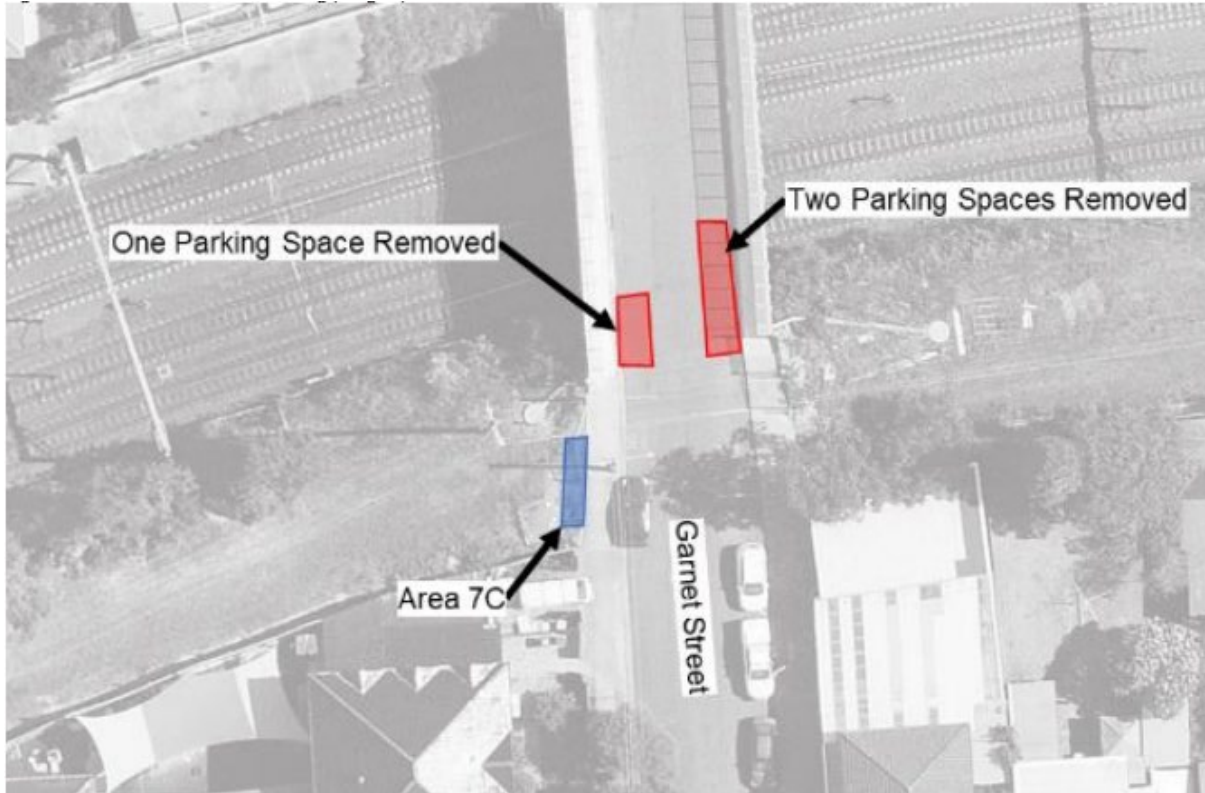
HP2 – M24 8.880D Parking Space Loss
